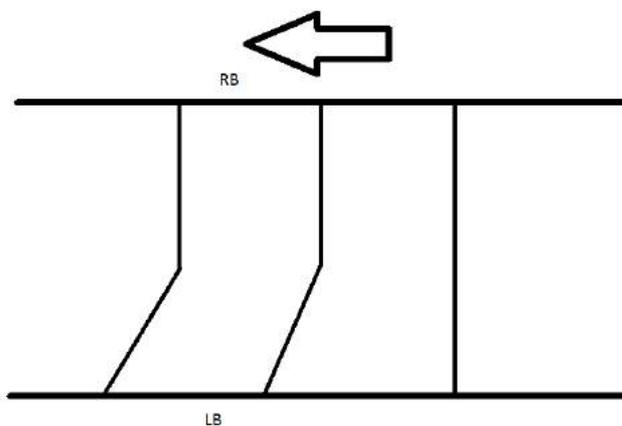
Site plan for Crane-Thames Barrier
